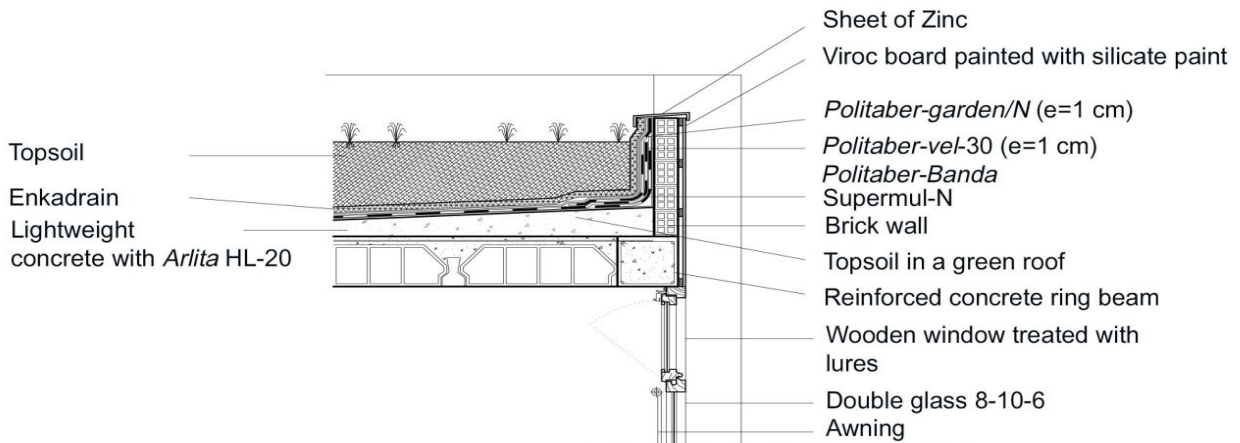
Construction detail of the green roof of *Mariposa* house.
